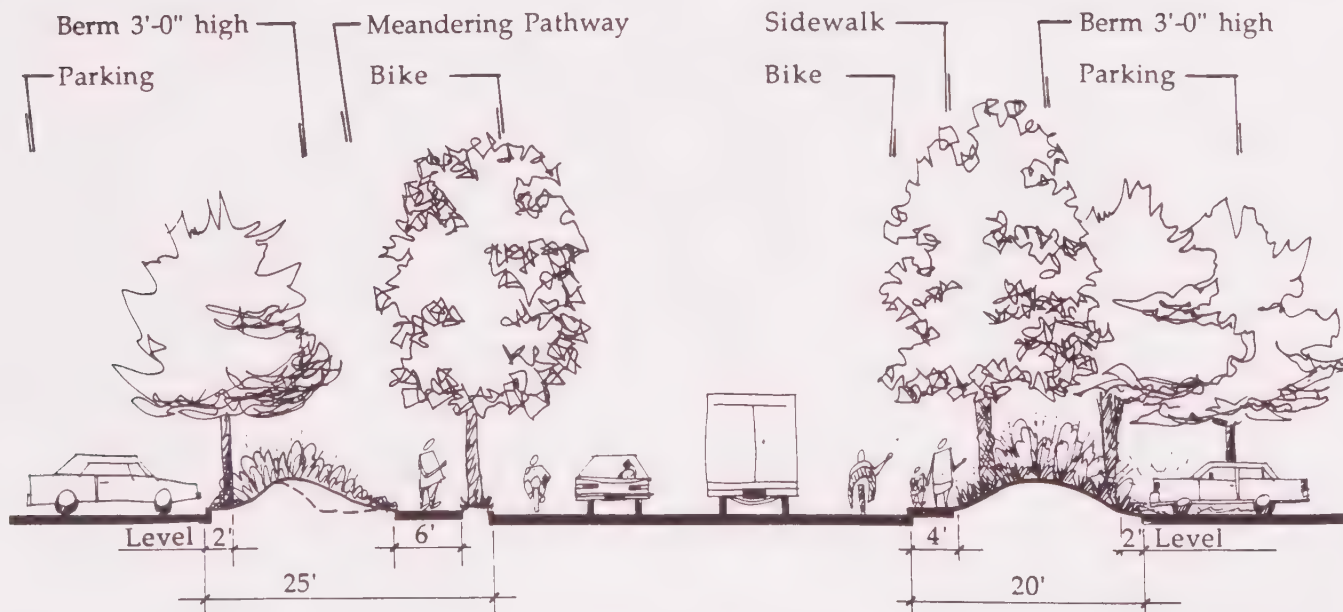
Typical Cross Section at Conde Lane Extension looking East (D' - D)
